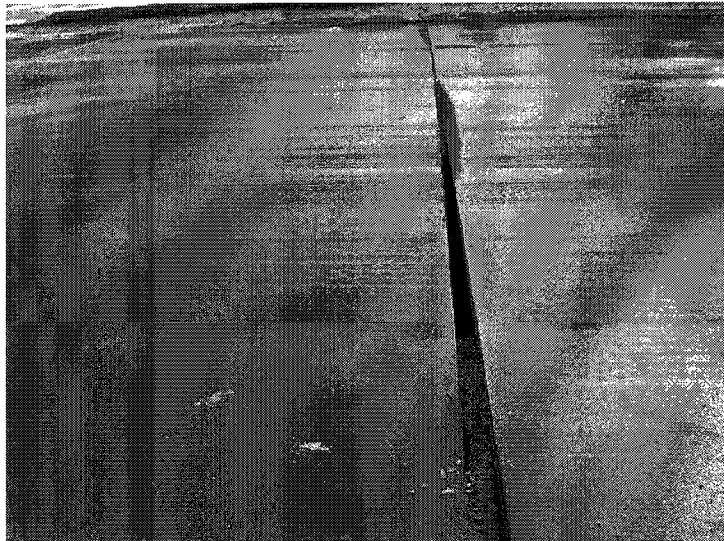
Looking east, welds between steel plates have failed; a 1.5" gap is present between Plates #2 & #3.
